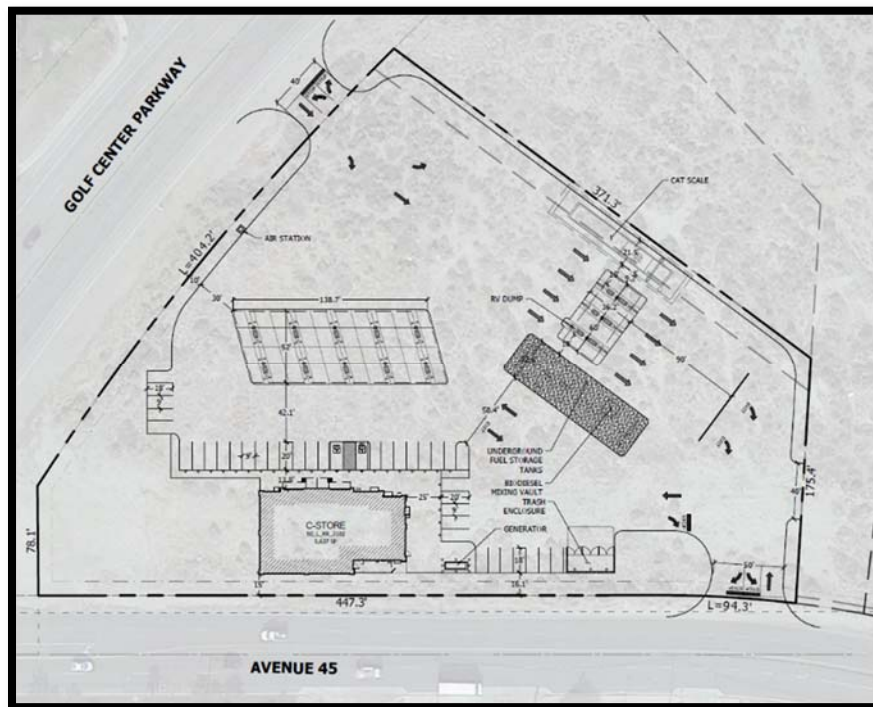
Preliminary Site Plan Showing Proposed Improvements.
